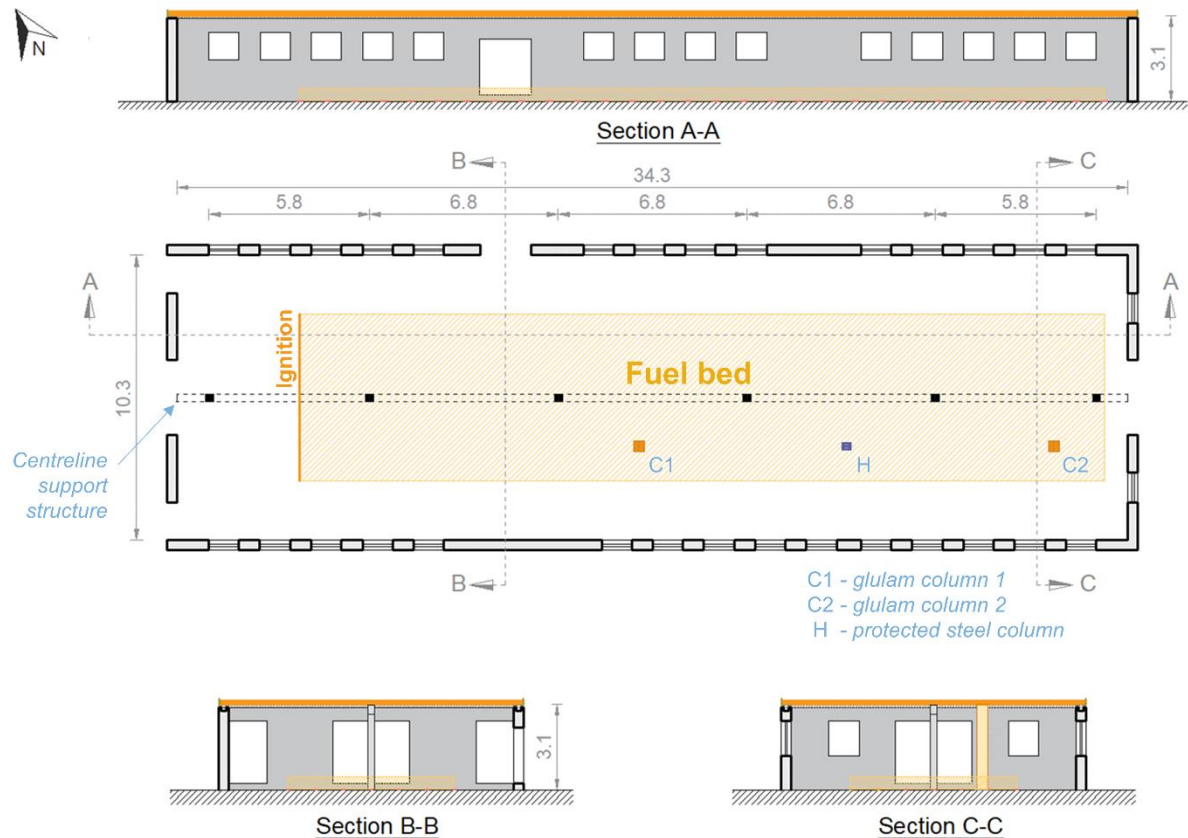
Floor plan and sections of the compartment used for the *CodeRed #01* experiment. Units in metres.
